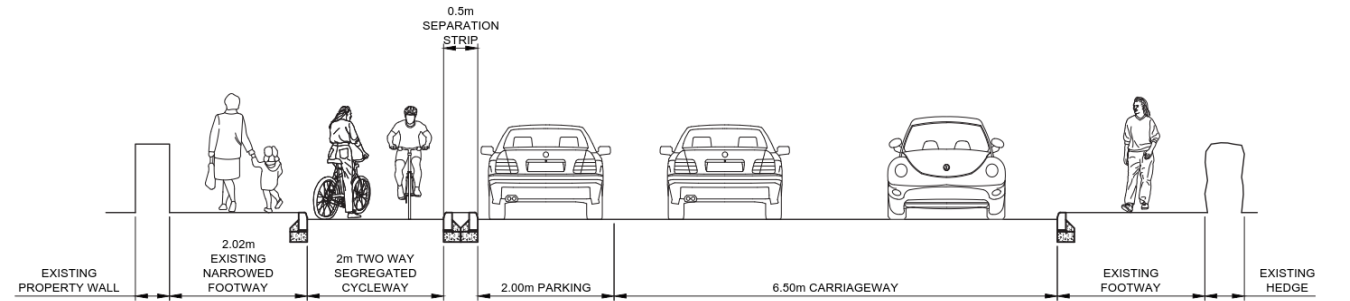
Cross Section Route 2 - Linkfield Road (A199) to Levenhall Roundabout
